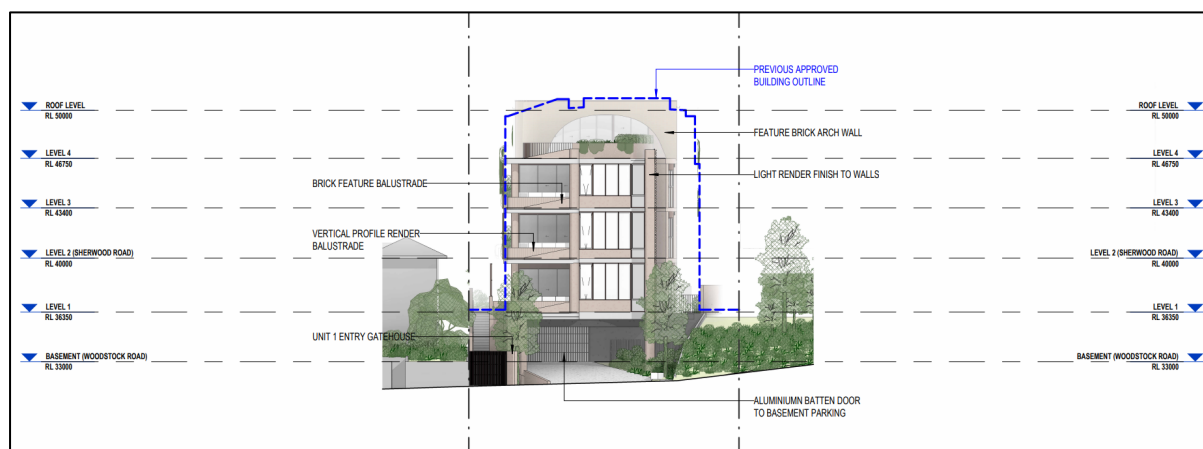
Woodstock Road elevation, with change in heights highlighted in blue
